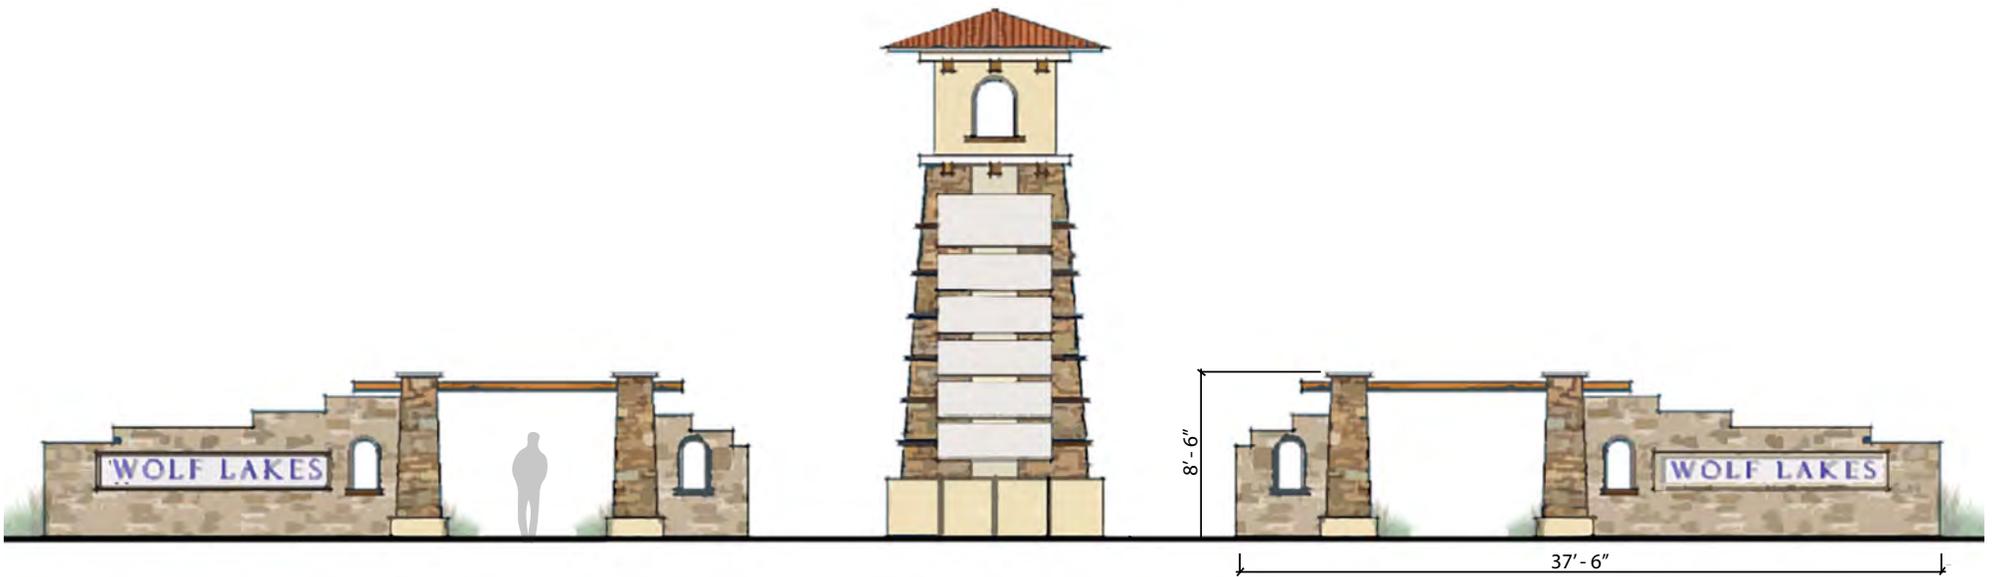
PERIMETER SIGNAGE PLAN
